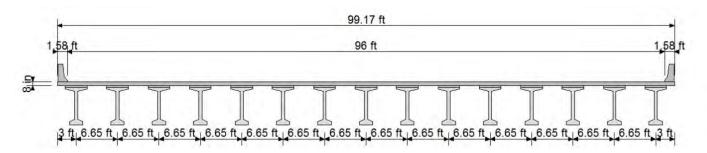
UPRR Overpass Bridges - NB Bridge Typical Section
